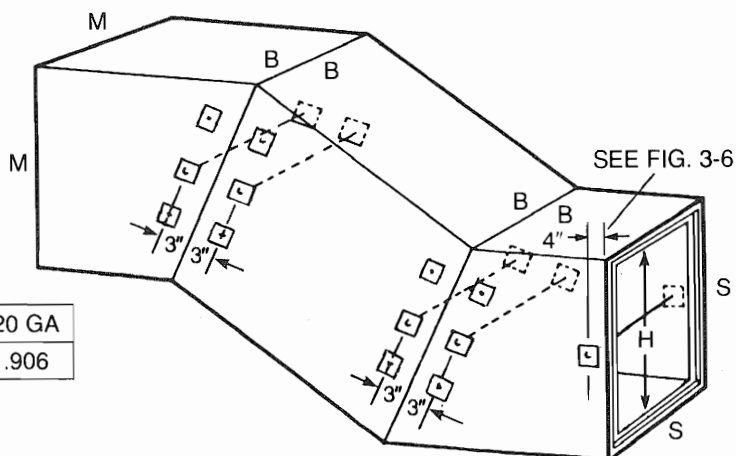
REINFORCEMENT CHEEK PANELS WITH BUTT JOINTS
